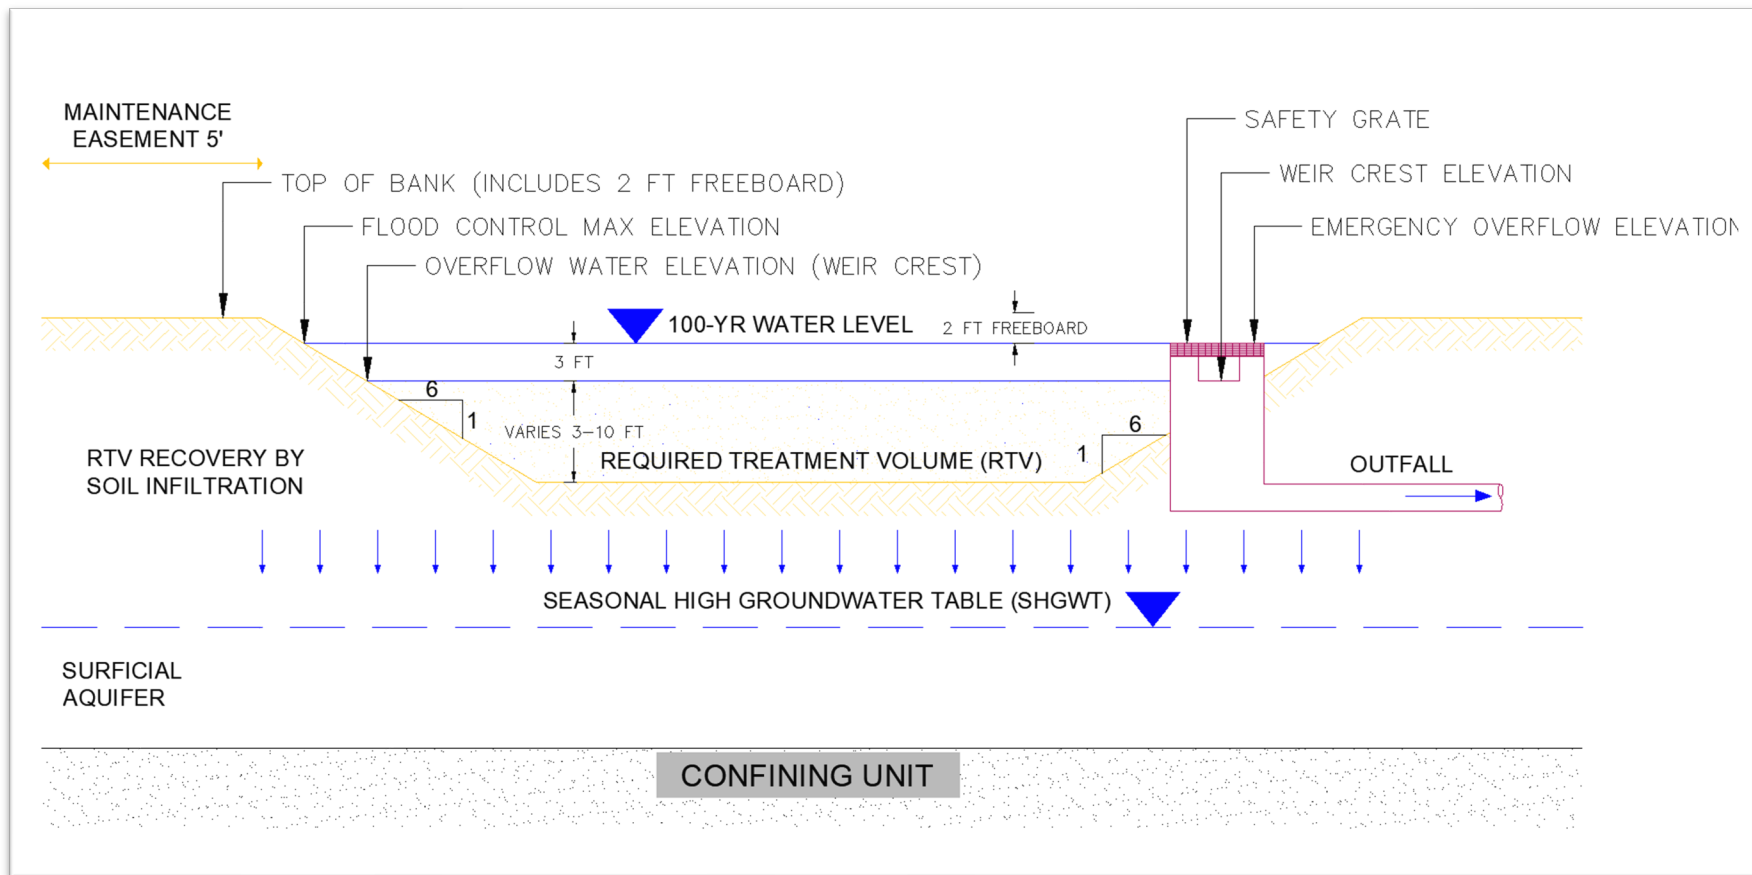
Typical Cross Section of Natural Preserve (Dry Pond)
